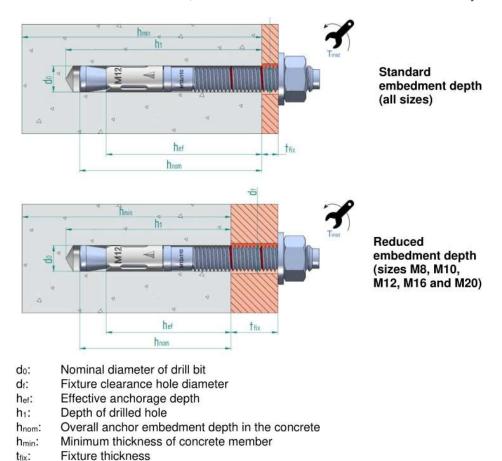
Walraven expansion anchors WT7: On-site geometry, from [P1]
